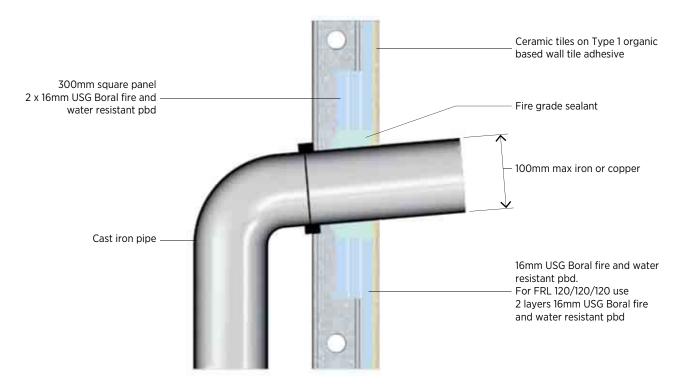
Penetration Detail - Copper/Steel Pipe - Twin Stud - FRL 60/60/60
